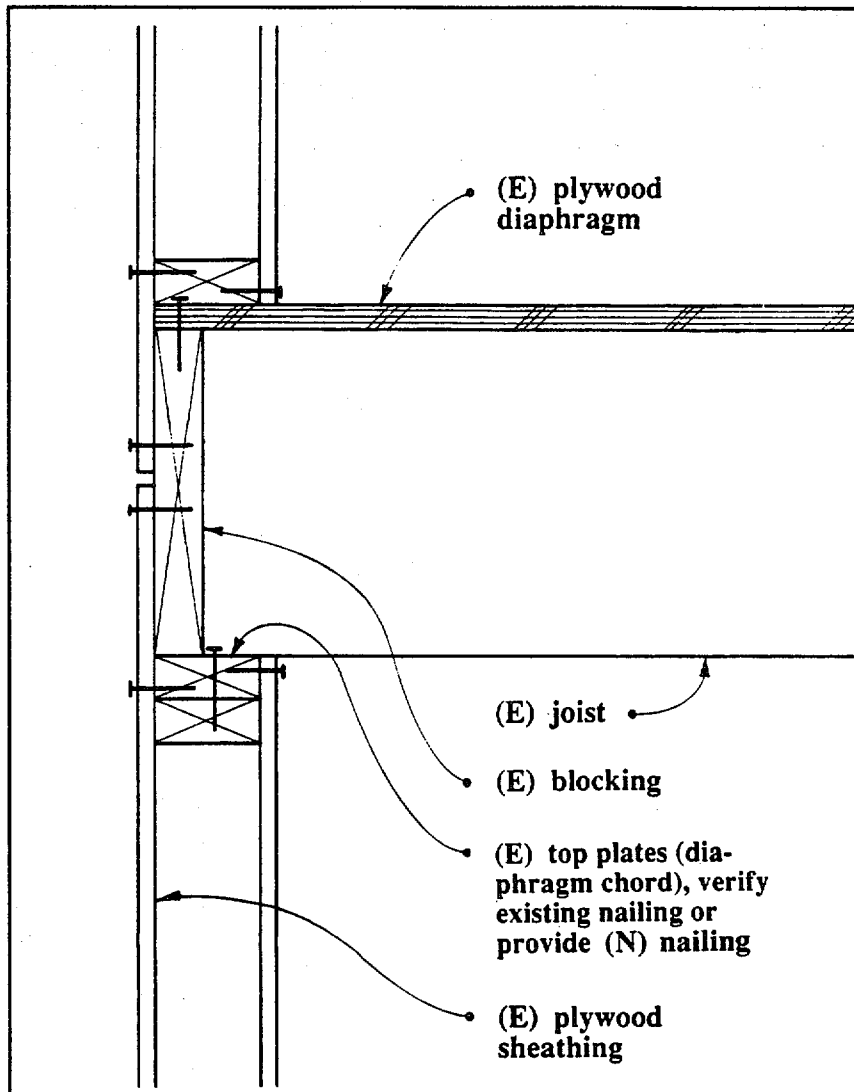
Exterior sheathing and top plate chord in a wood frame building.
